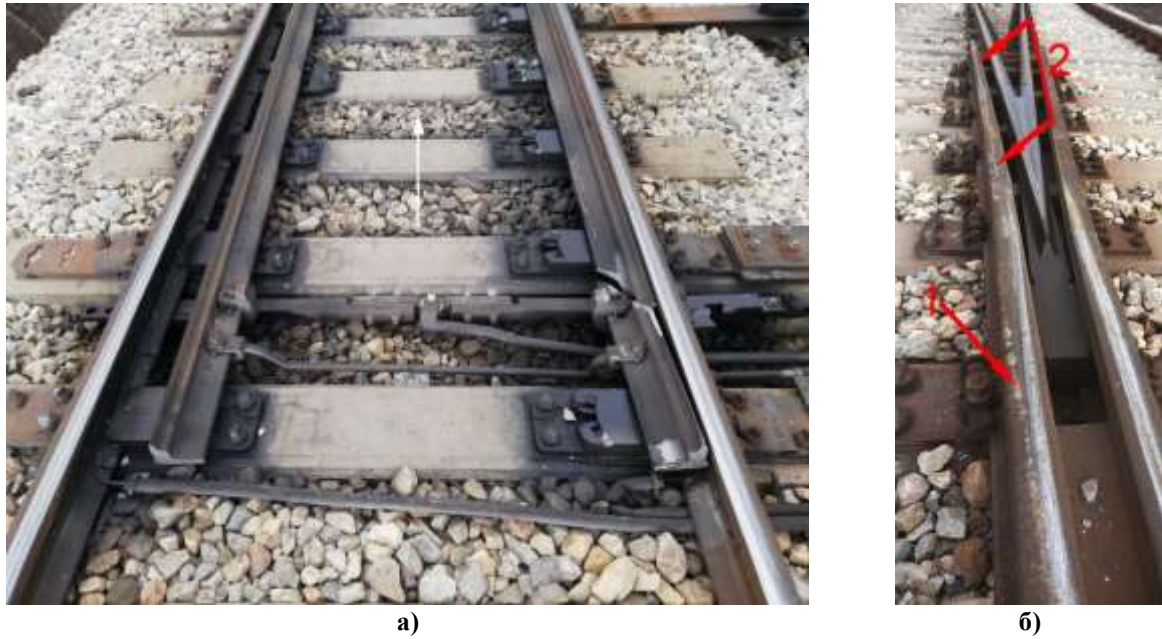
Broken switch blade and wheel marks on the switch point of switch No. 6 at Vrčin station
